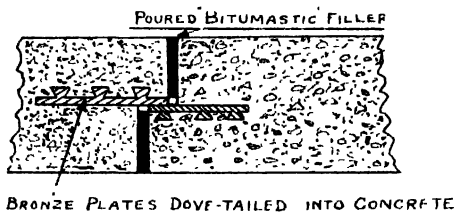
BRIDGE SLAB TYPE EXPANSION JOINT
